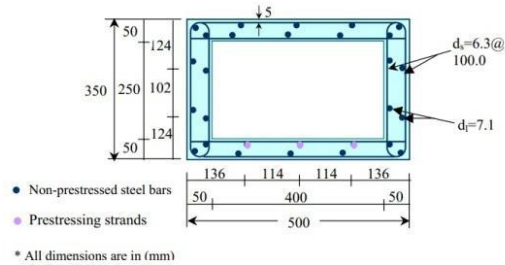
Dimensions and reinforcement details of the cross-section of prestressed concrete box beam (TH-II-C1-P).
